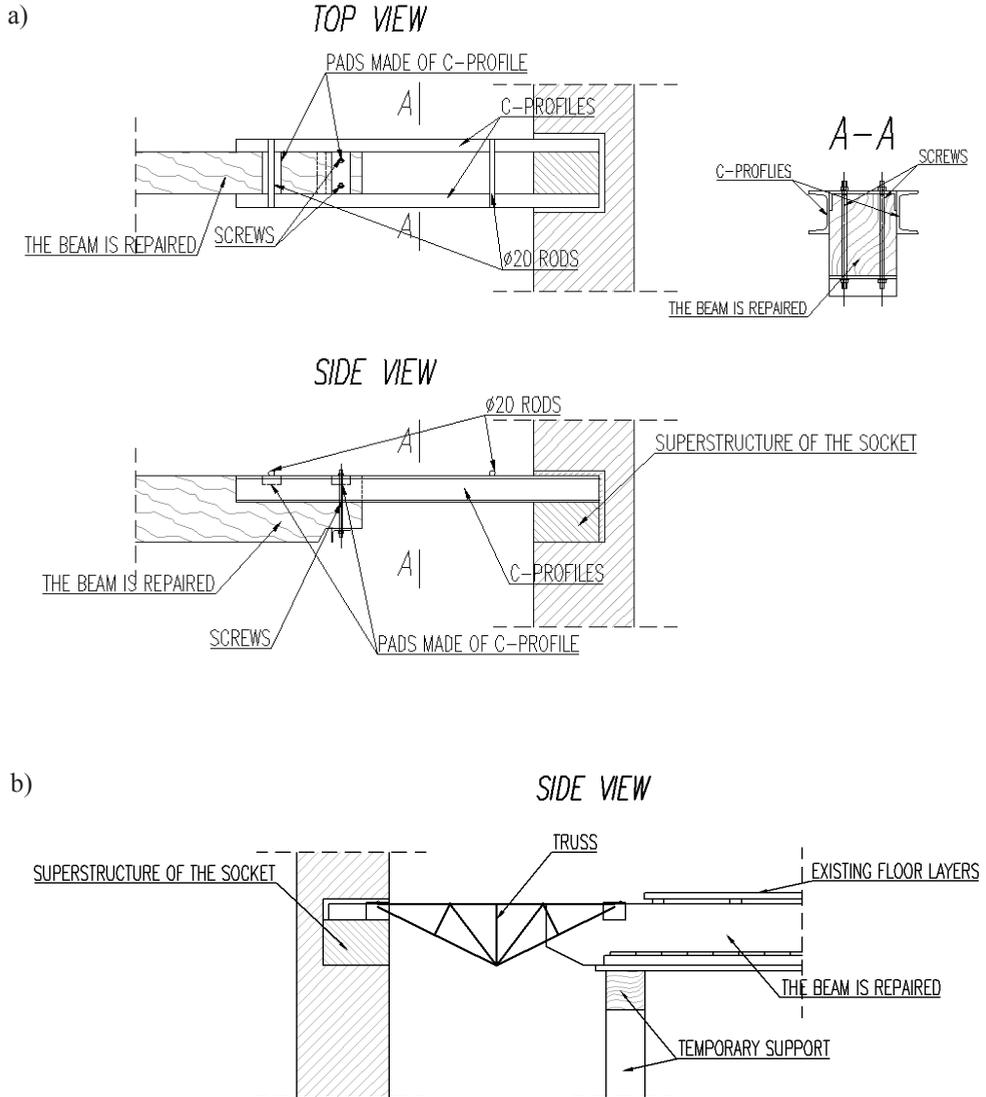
Replacement of support zones of wooden beams for steel elements: a) truss, b) profiles [4]
